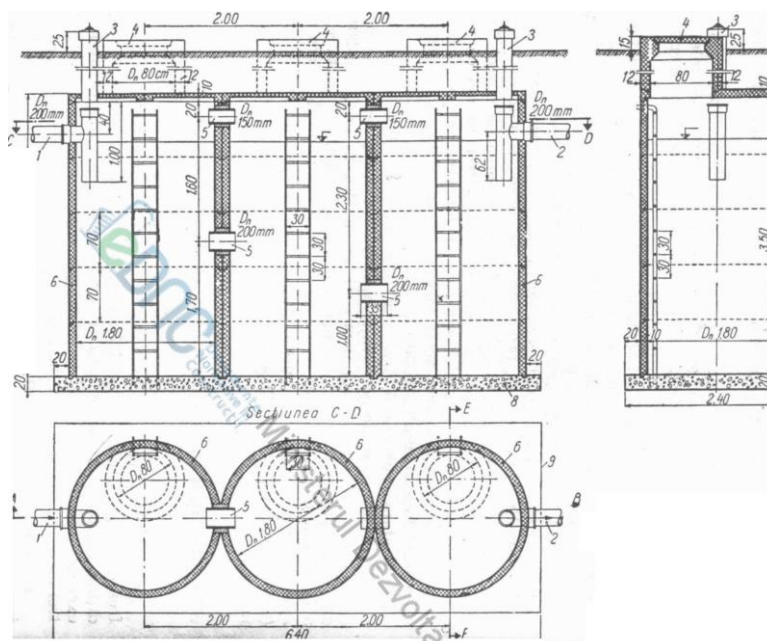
Septic tank of off-the shelf rings: 1 – inlet, cast iron drain pipe; 2 – outlet, cast iron drain pipe; 3 – cleaning basket; 4 – reinforced concrete or cast iron tap; 5 – concrete tube; 6 – precast concrete tubes B250; 7 – cement mortar; 8 – concrete B90; 9 - compacted clay ground boundary layer
